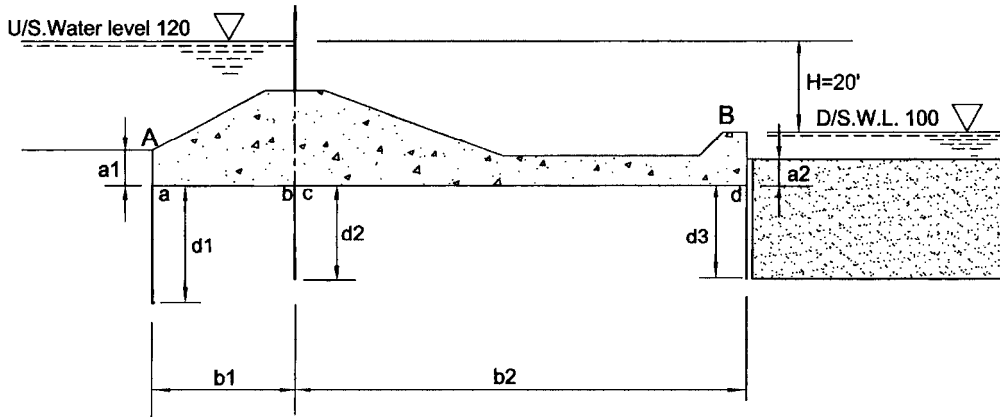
Hydraulic Structure with Three Sheet Piles
